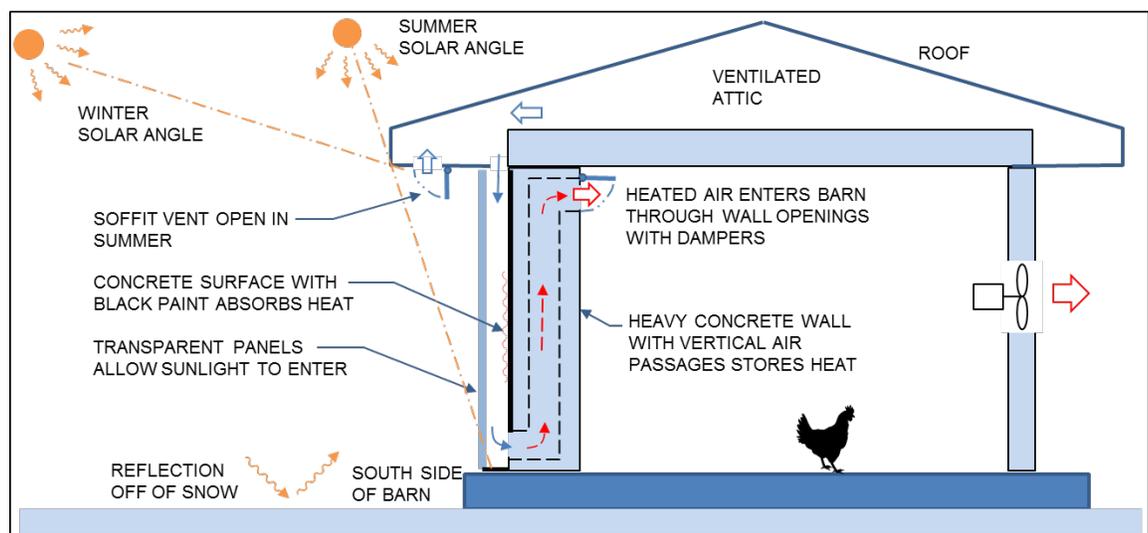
Solar Ventilation Wall with Heat Storage Concept
